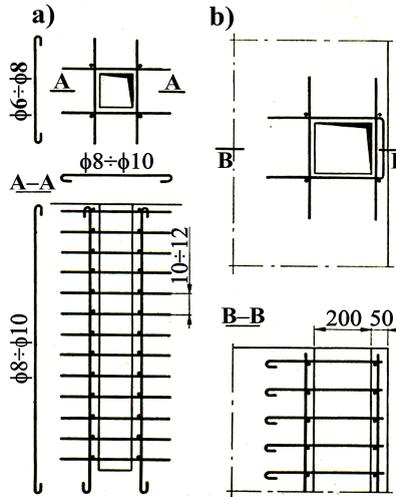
Reinforcement of holes for anchor foundation bolts: a) at a distance from the edge, b) at the edge of the foundation
